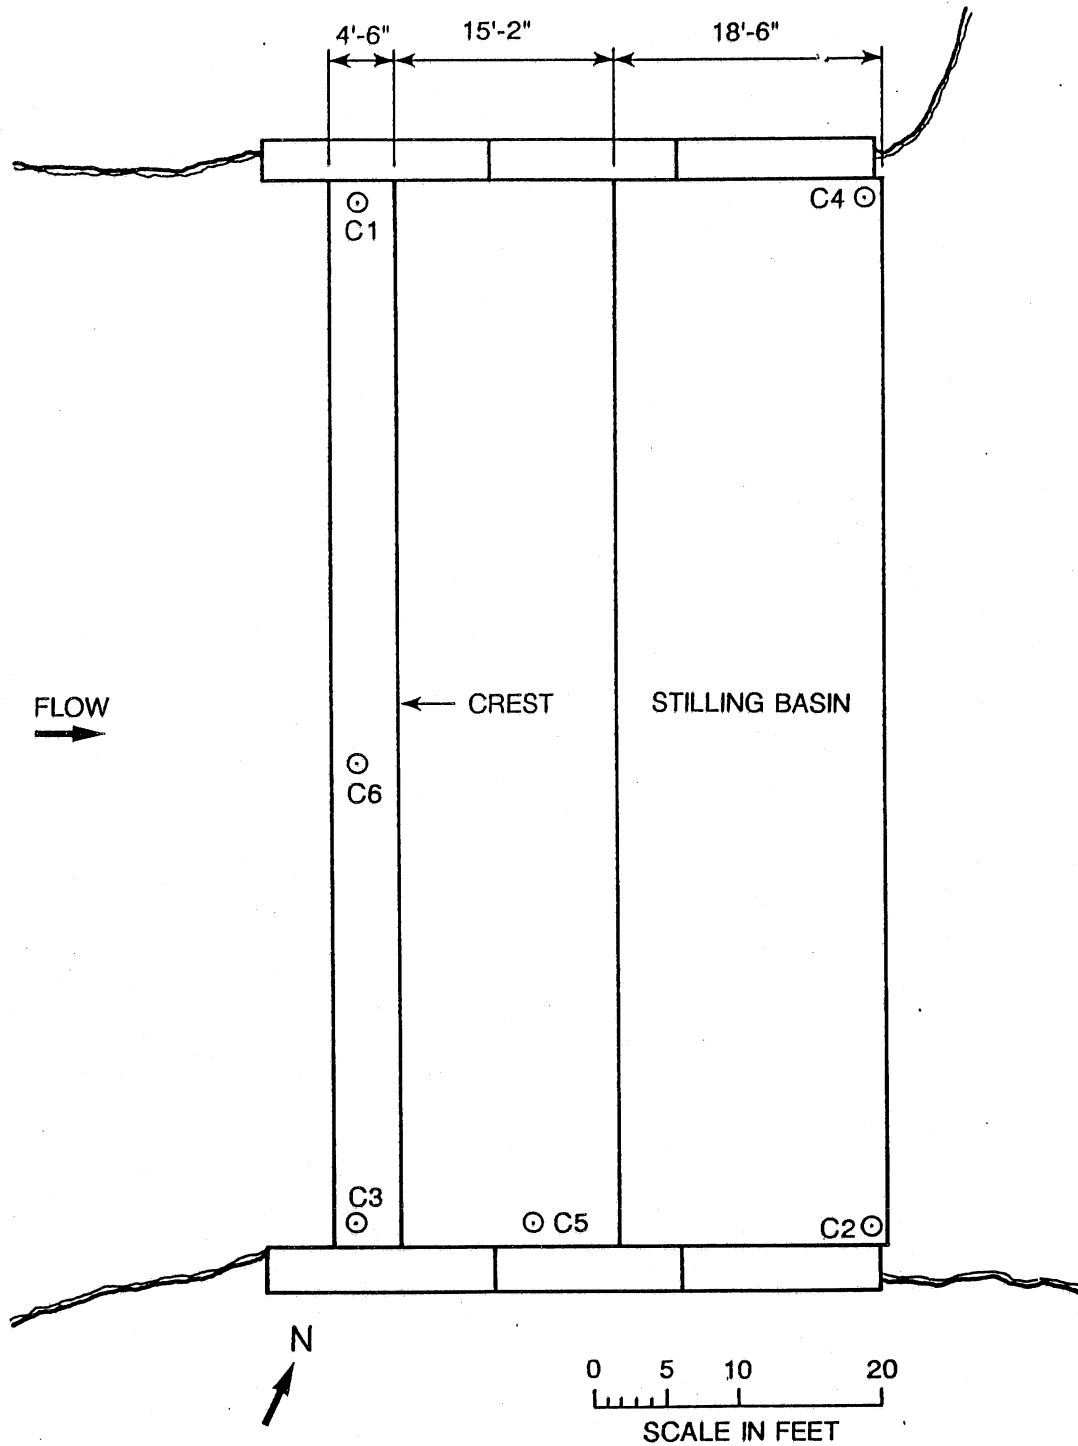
Plan view of December 13, 1985, sampling locations.
